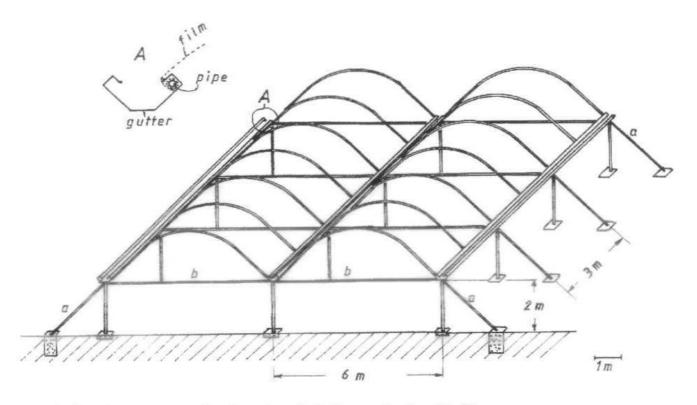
Greenhouse construction for subtropical climate, developed in Hannover.
